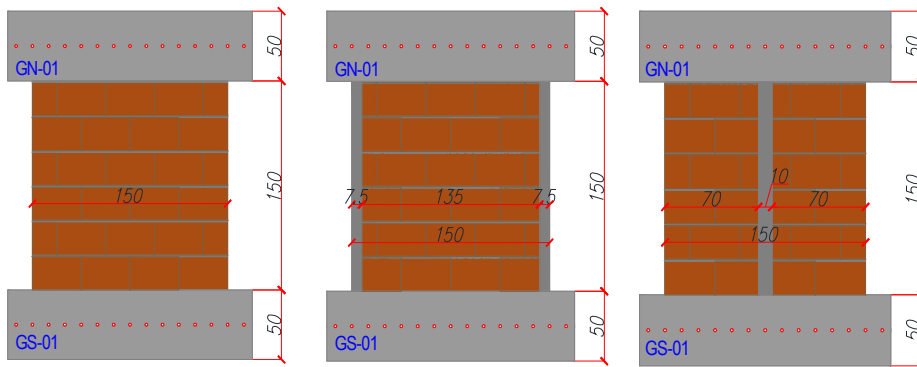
Wall specimens in bear state (URM, RM1 and RM2)
